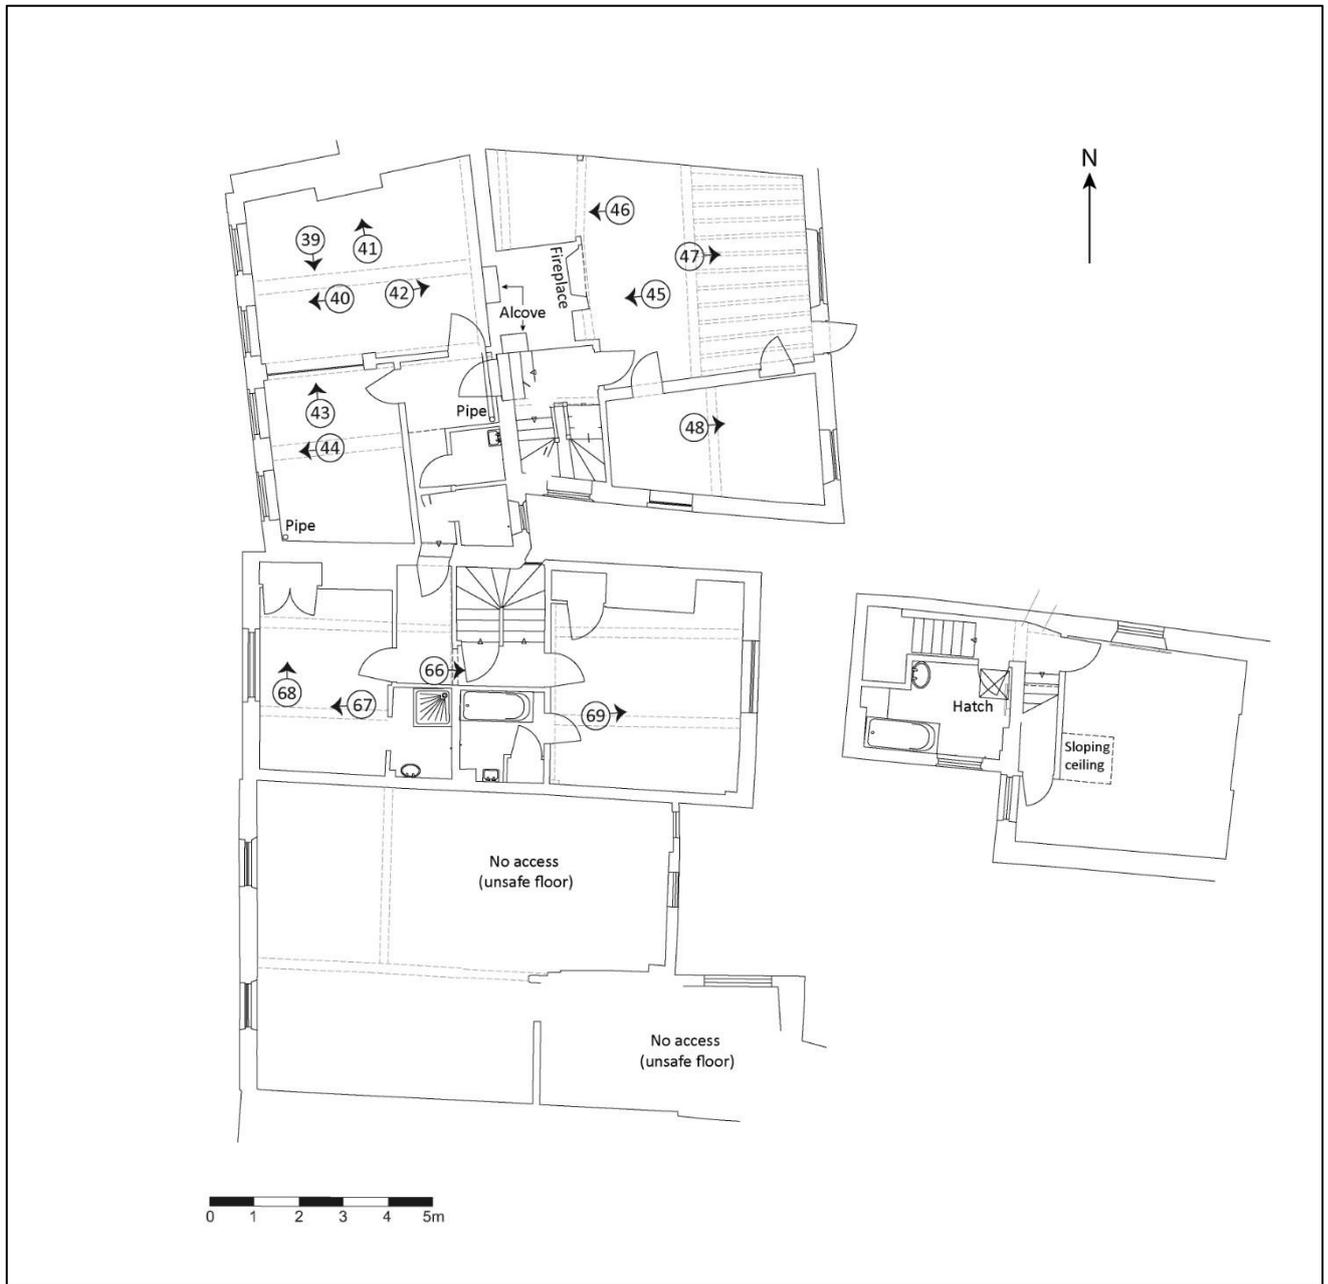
Annotated plan of first floor of Nos 17 & 17A High Street showing location of photos taken
